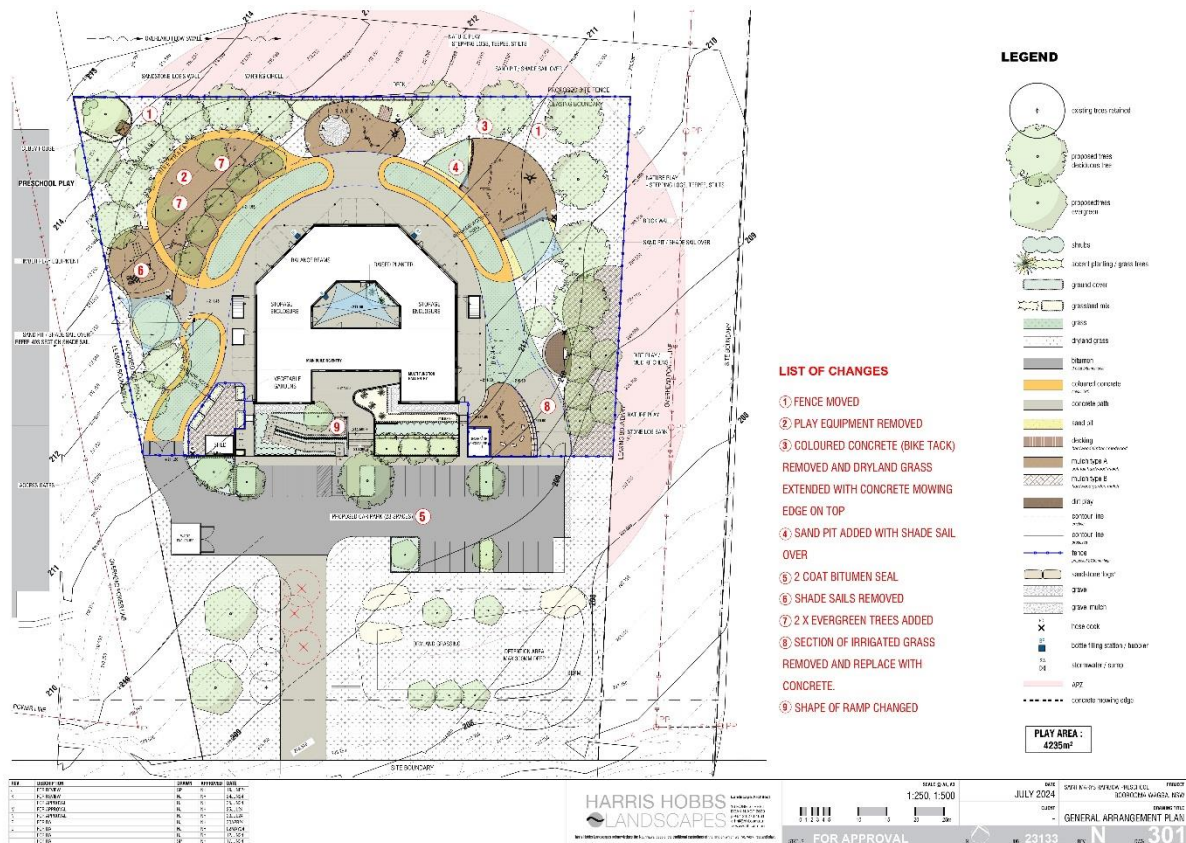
PROPOSED LANDSCAPE PLAN
